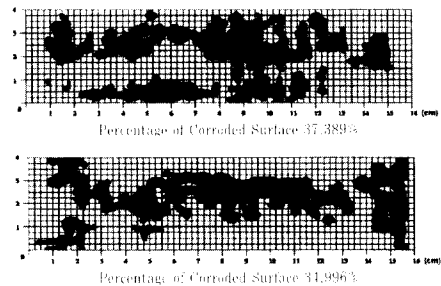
Corroded Surface Area for Reinforcement Steel in Concrete Specimens Labelled in CI/AB6
